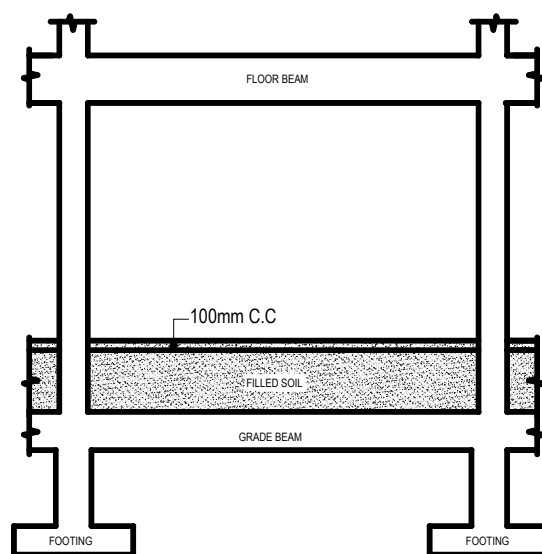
Effects of plain concrete on column height at ground floor
